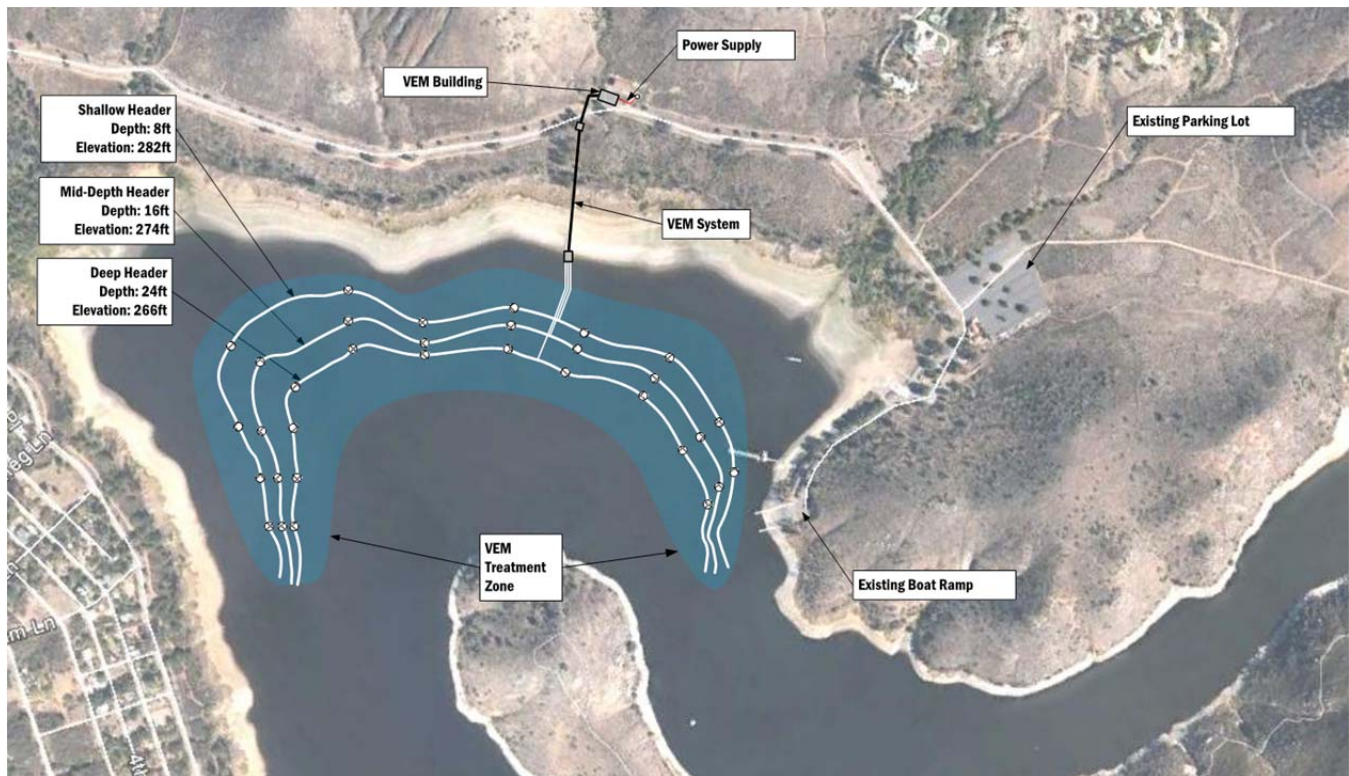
Conceptual Layout of Proposed Mid-Lake VEM System Near Boating Area
